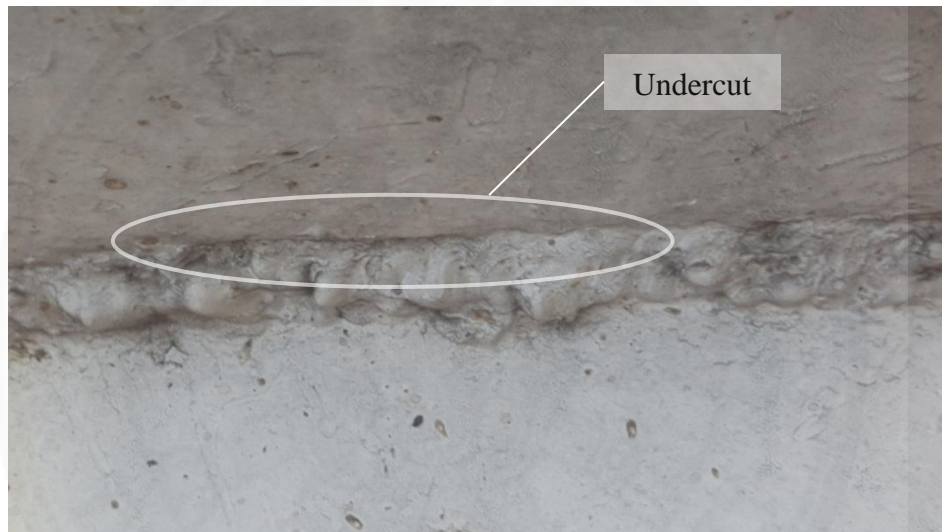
Welding defects on Steel Structure B (joint 1)
